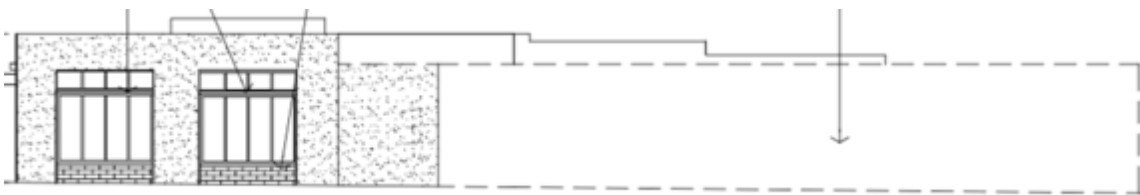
N. Catalina Ave., front (west) and proposed side (south) elevation
